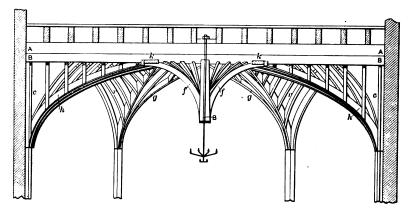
Sectional Elevation Indicating the Method of Construction.
